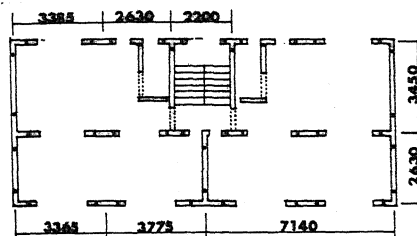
Plan and bottom joints layout (B test Ref. 2)
